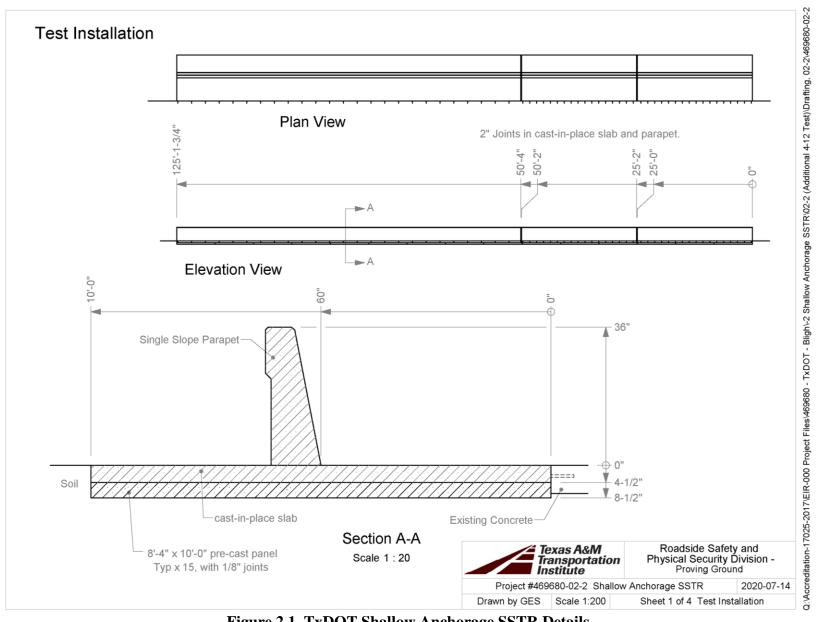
TxDOT Shallow Anchorage SSTR Details.
